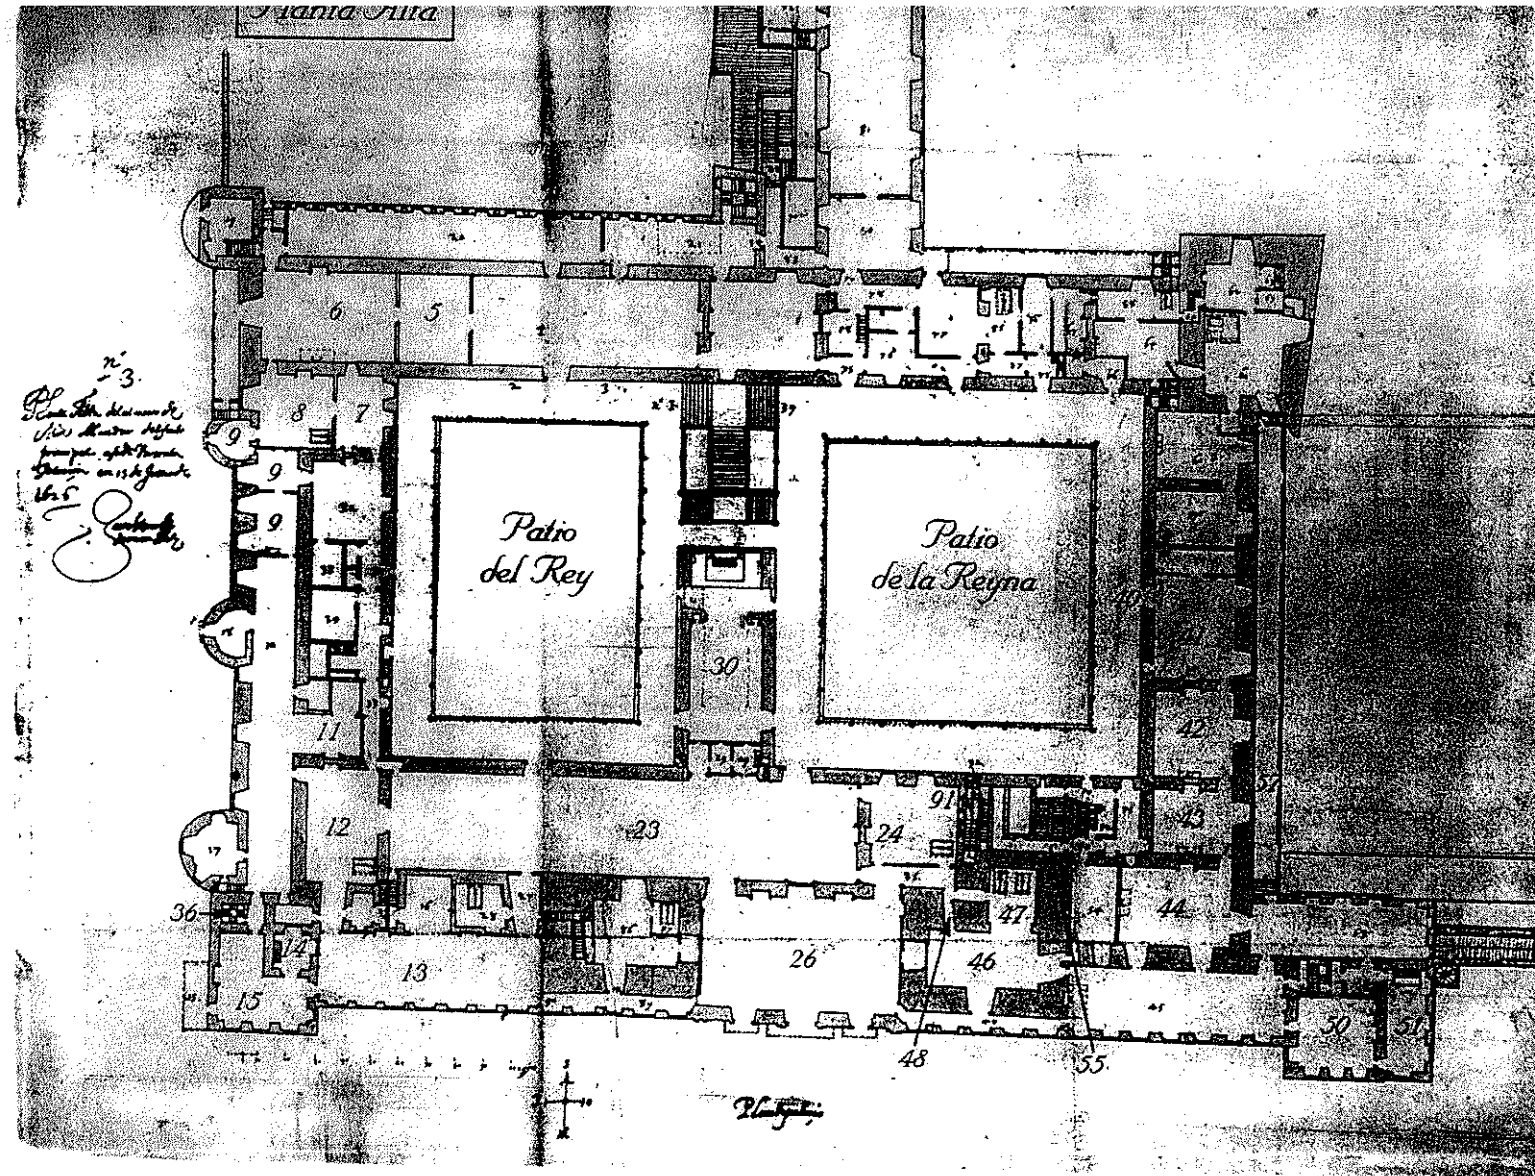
Floor Plan for the Upper Floor (*Planta Alta*) of the Real Alcázar in Madrid, designed by Juan Gómez de Mora, 1626 (Foto Biblioteca Vaticana).
